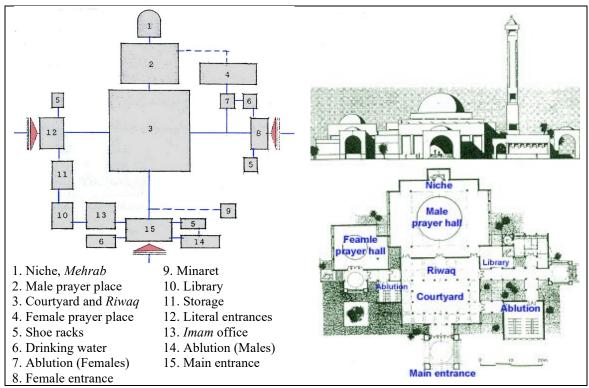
Zoning diagram of a contemporary mosque, with exemplary plan and façade [3]
